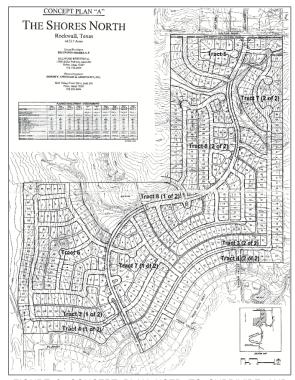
CONCEPT PLAN USED TO SUBDIVIDE AND PERMIT HOUSING IN THIS SUBDIVISION
